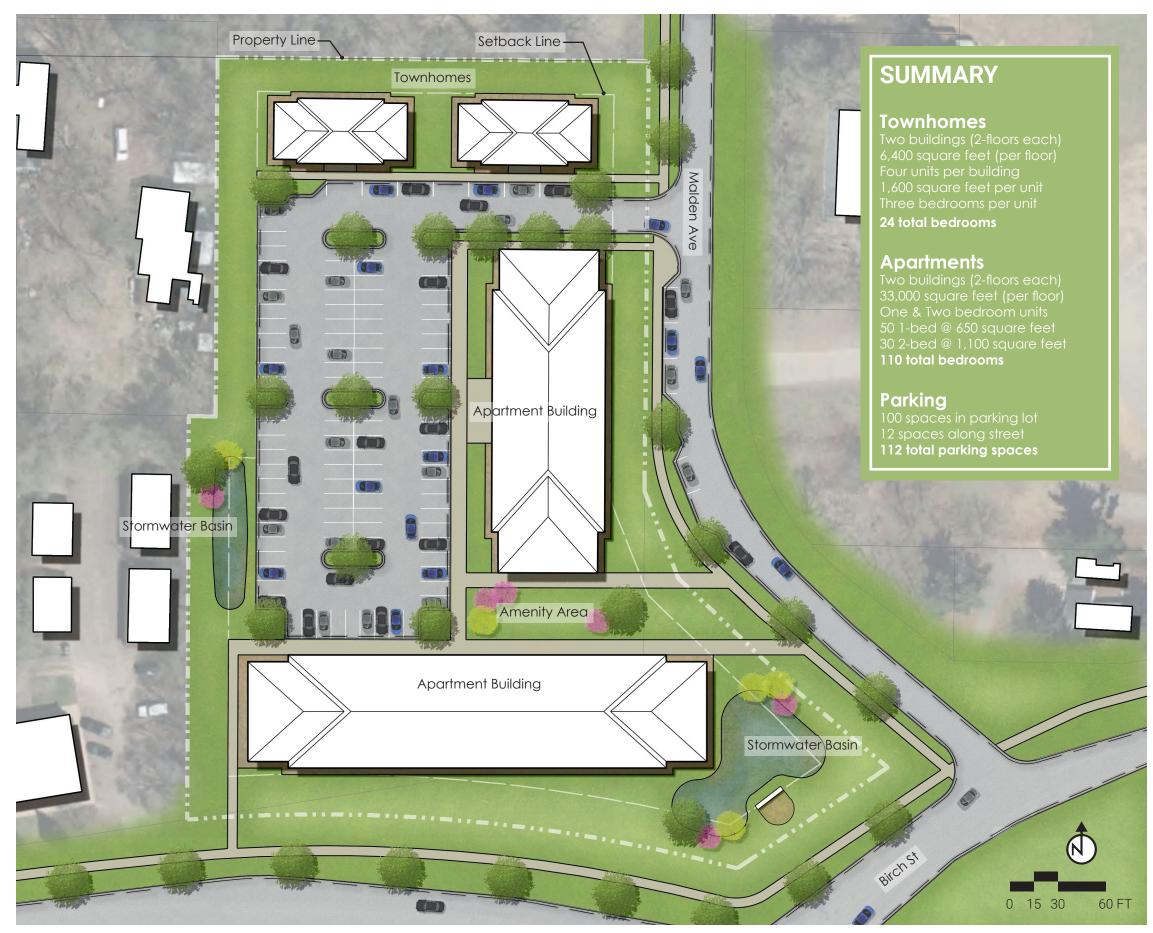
Figure F. Mixed-Use Preferred Site Plan (Ayres)
